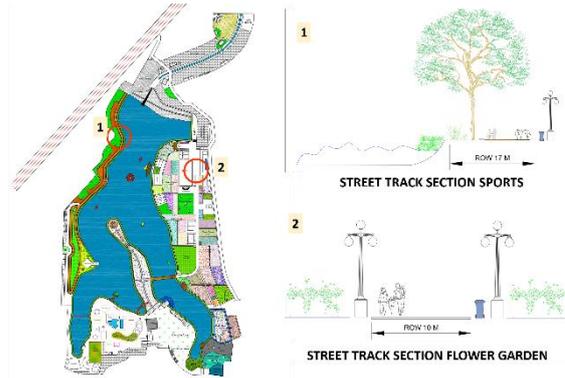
Design Plans and Cut Road Plans, processed researchers & GIS 2020
